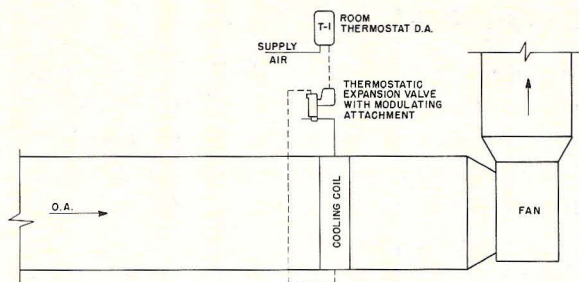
Typical Control of Thermostatic Expansion Valve Equipped with Modulating Attachment
